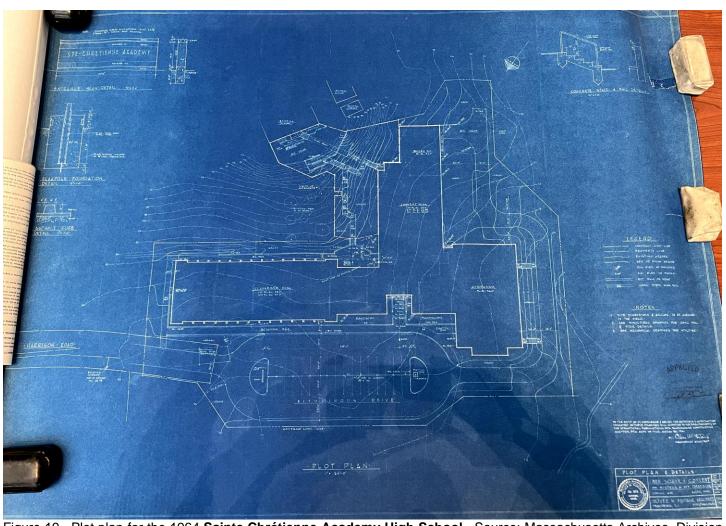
Plot plan for the 1964 Sainte Chrétienne Academy High School. Source: Massachusetts Archives, Division of Inspection, Building Inspection Plans.
